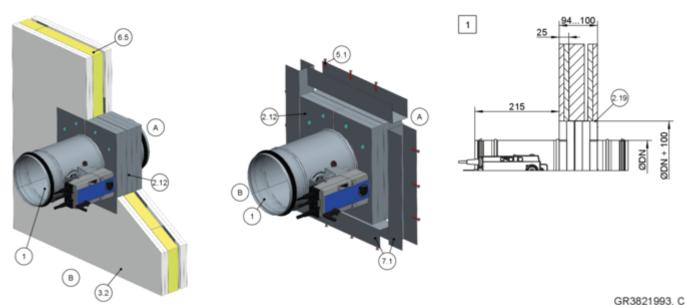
Dry mortarless installation in lightweight partition wall with installation kit GL2 during wall construction
